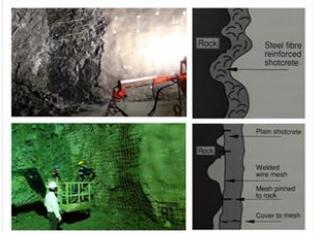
Top: Single shell shotcrete final lining with fibre reinforced shotcrete and pre-excavation grouting to control water inflow consists of an initial 5cm layer of S(fr) and permanent C1-bolts each applied close to the face bottom. Wire mesh reinforcement demonstrates the difficulties caused by overbreak. (Credit: Right images courtesy 'Vandevaele')
